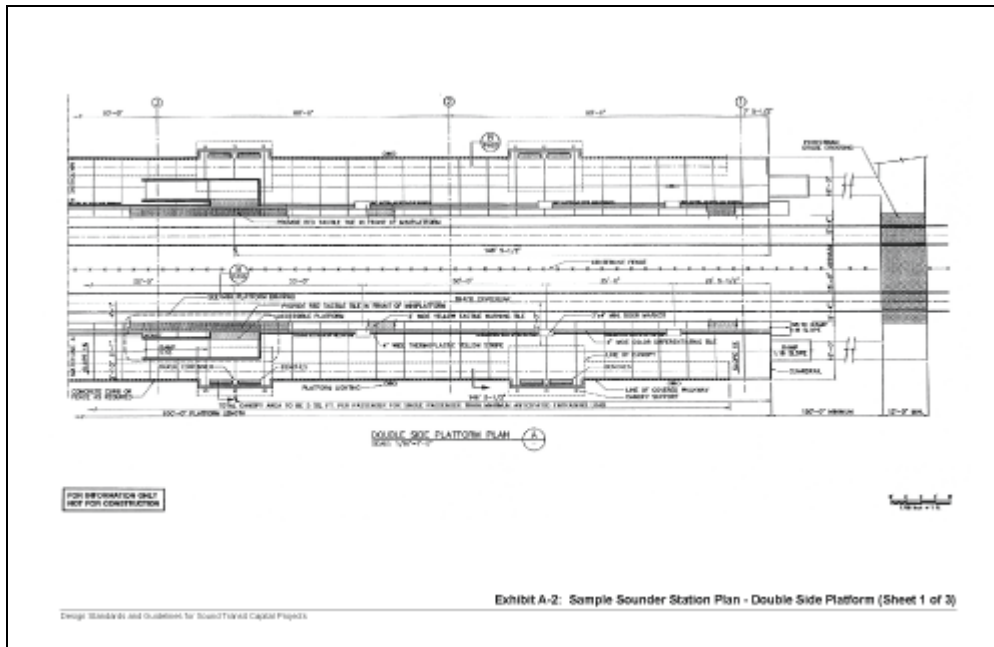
Sample Sounder Station Plan – Double Side Platform (Sheet 1 of 3)
